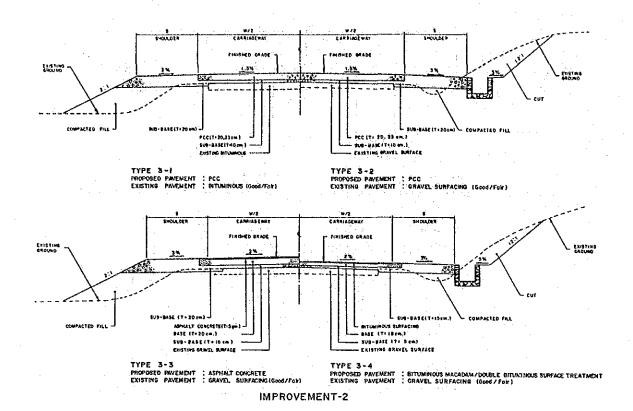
TYPICAL ROAD SECTION (3)
